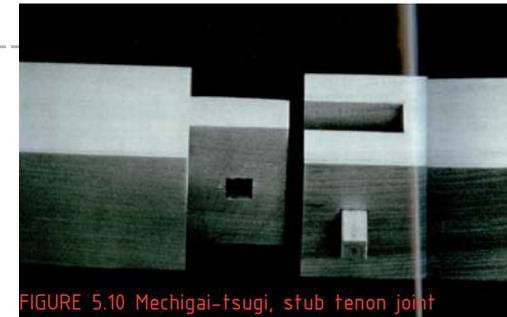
Mechigai-tsugi, stub tenon joint
